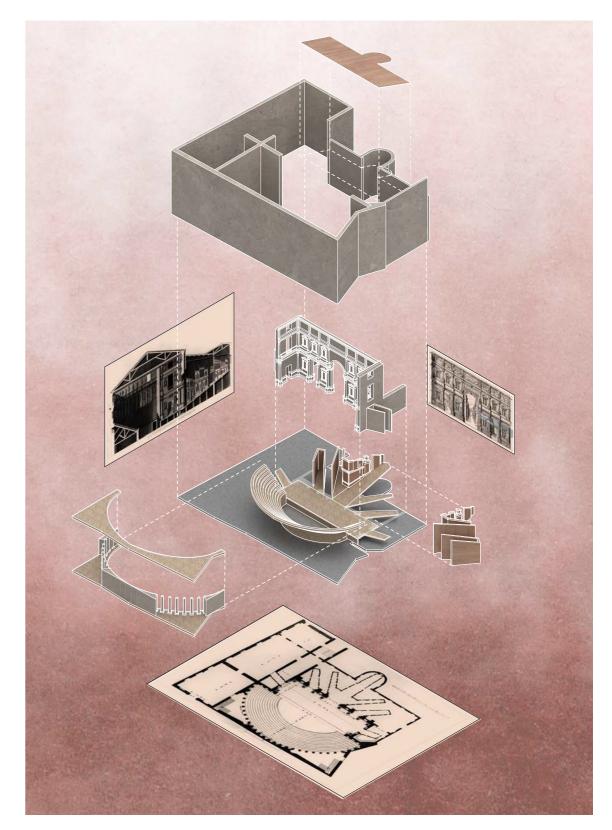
Exploded axonometric drawing of Teatro Olympico
